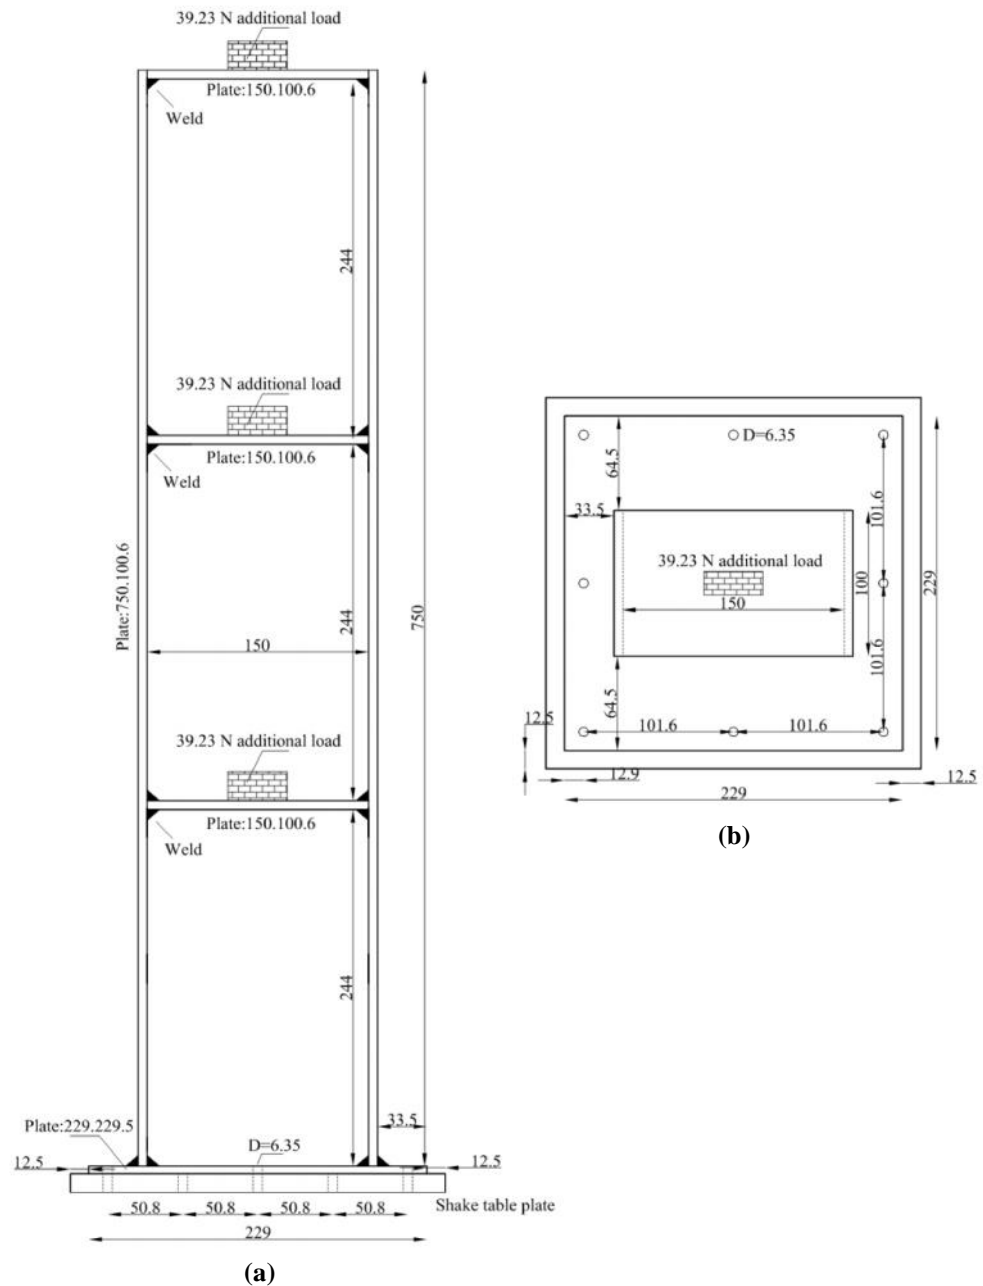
(a) Front view and (b) plan view of the specimen.
